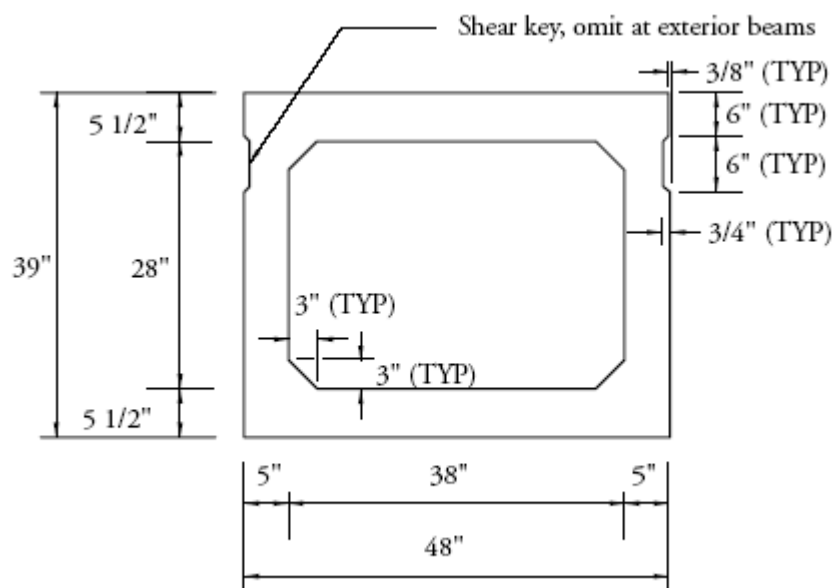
Cross-Section of AASHTO Box Beam Type BIII-48
